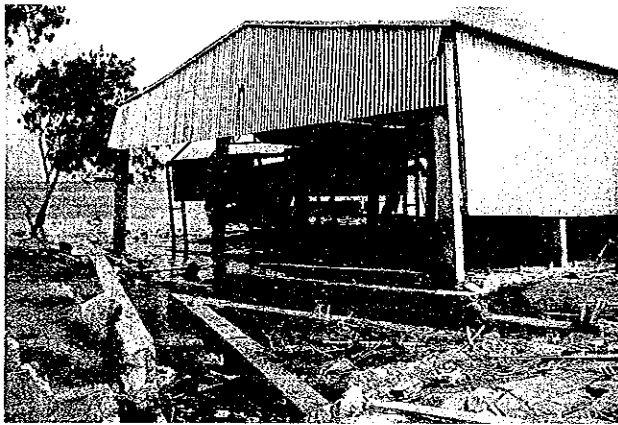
Freezing Factory of Fish Market; Damage of Settlement Due to Liquefaction
